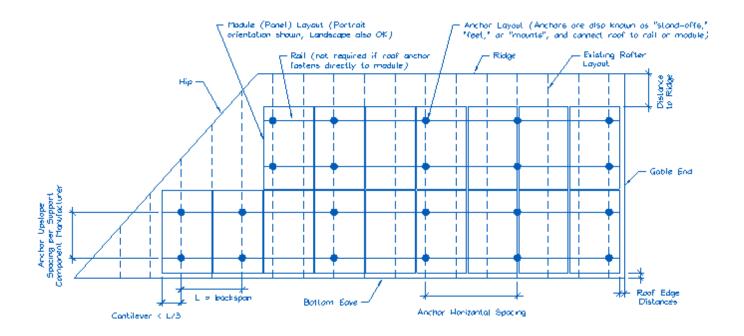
Sample Solar Panel Array and Anchor Layout Diagram (Roof Plan).
